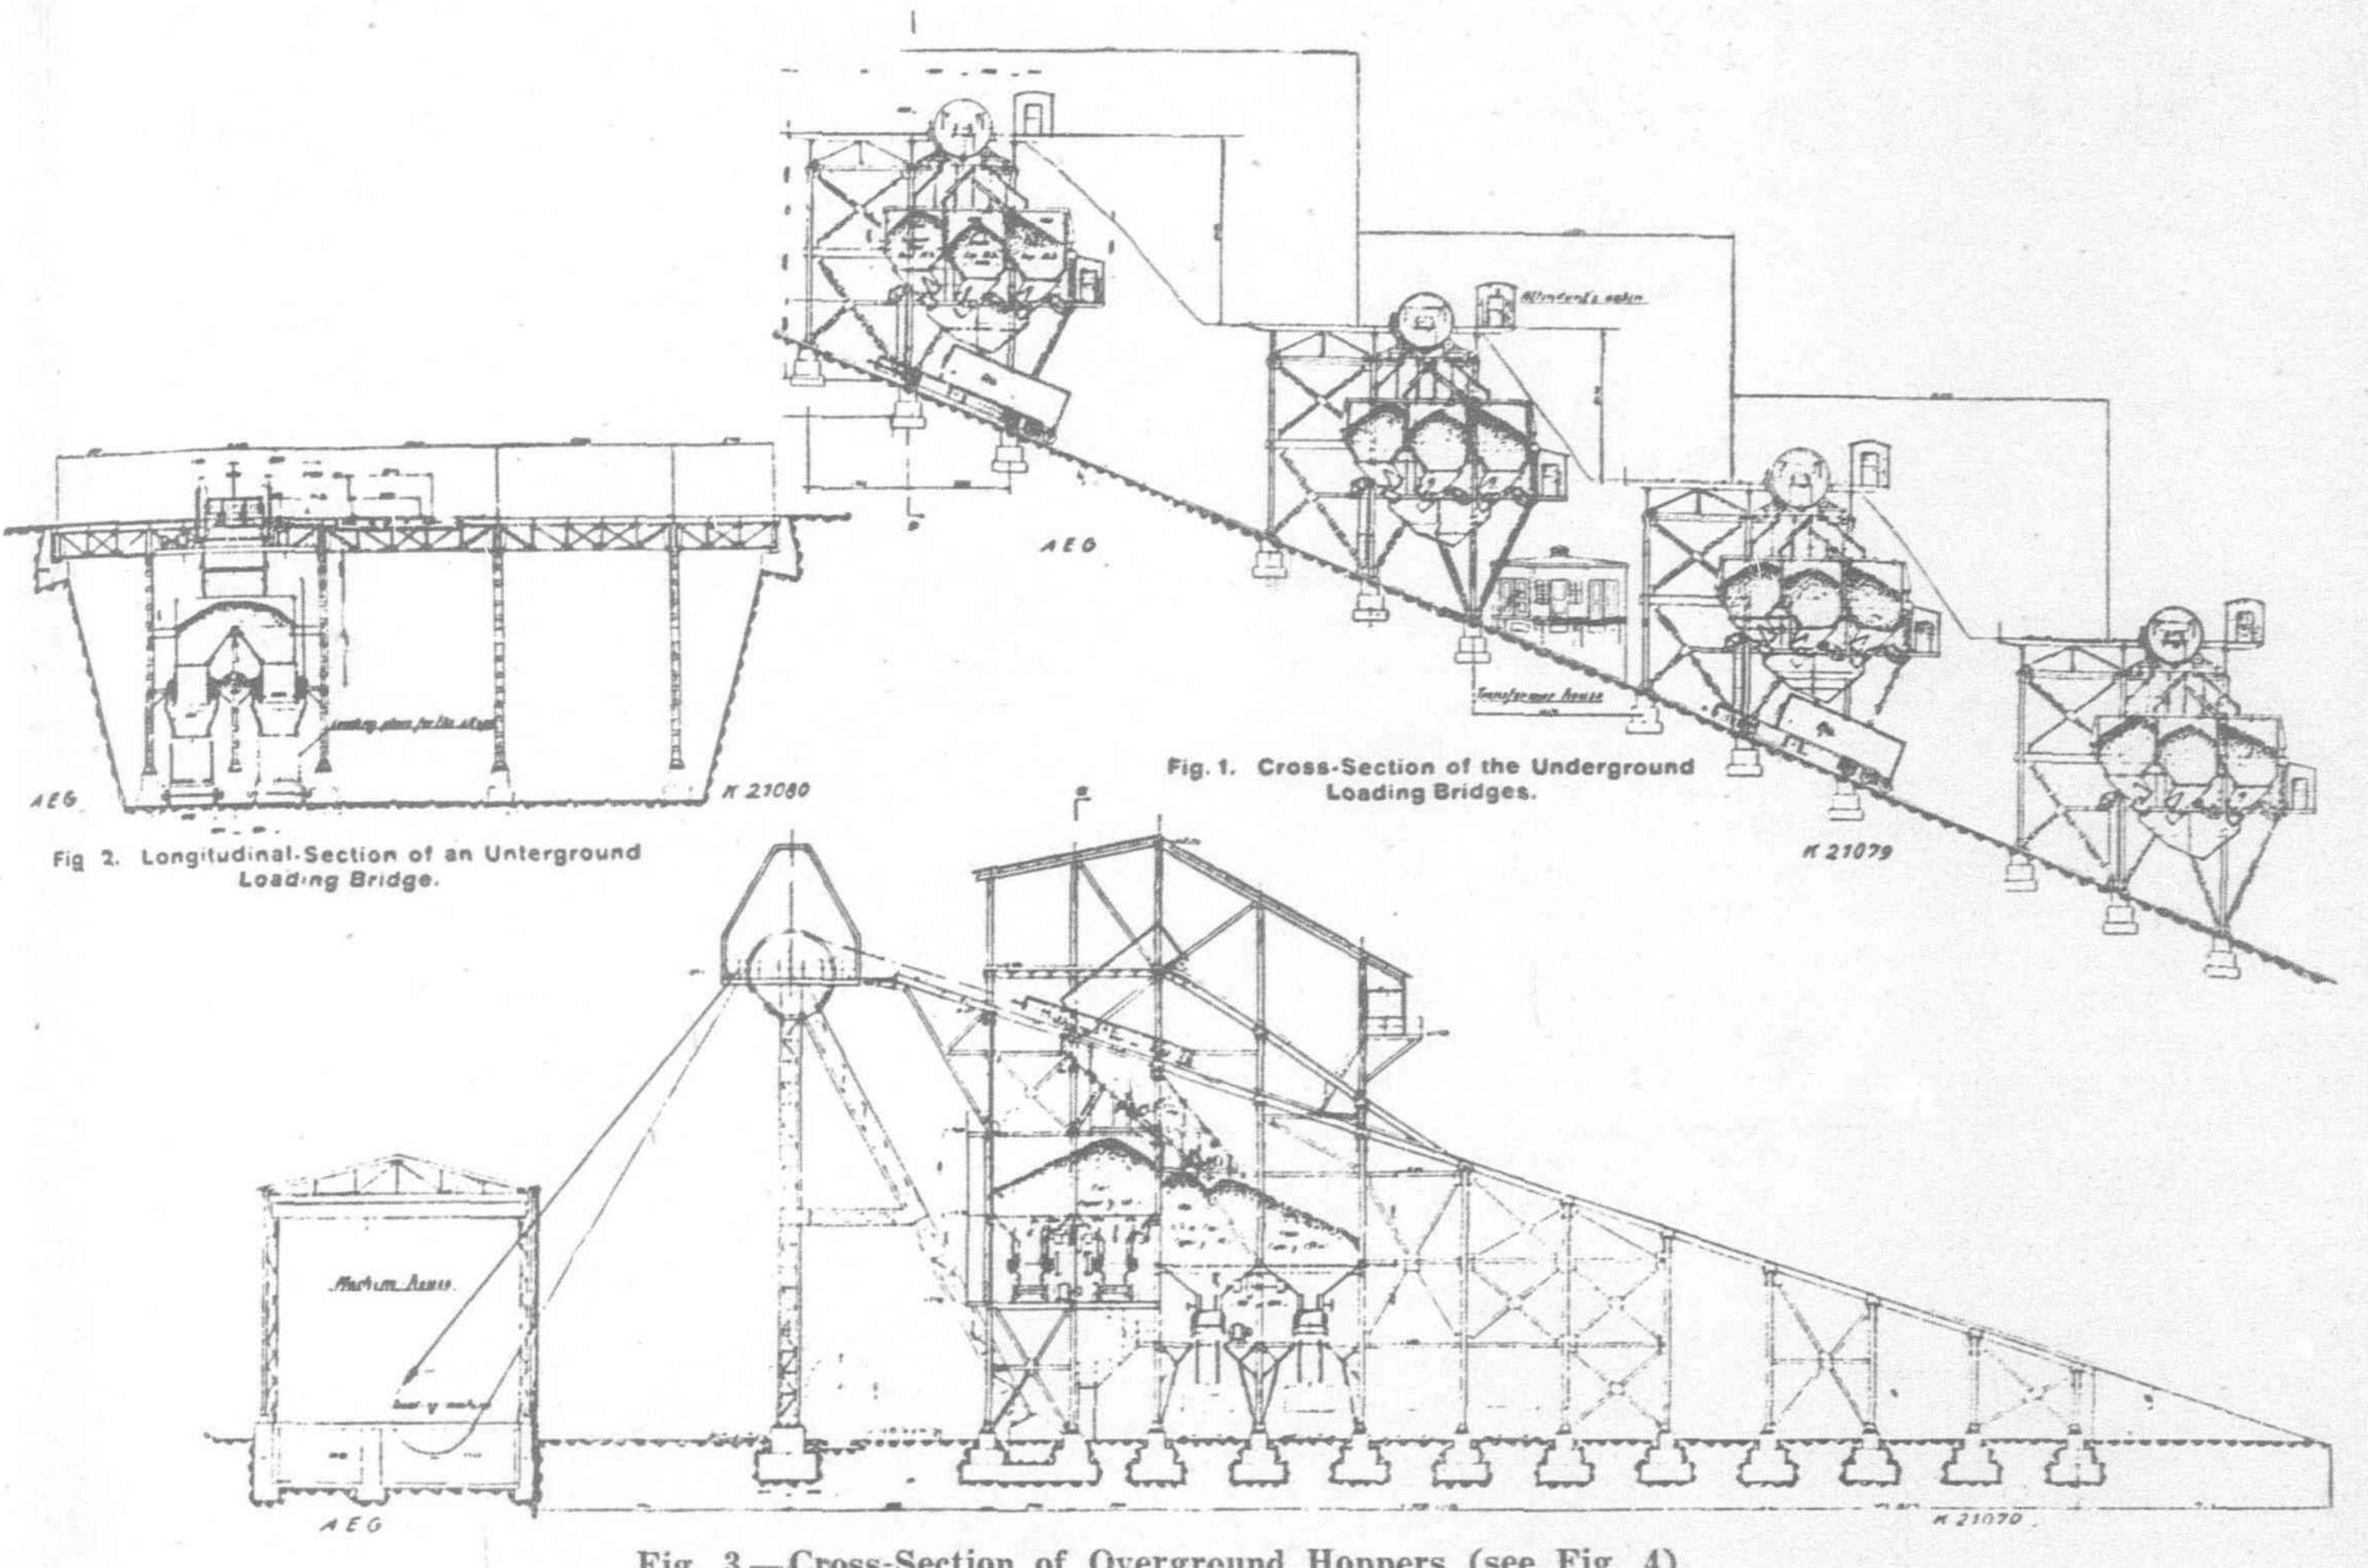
Cross-Section of Overground Hoppers (see Fig. 4)
